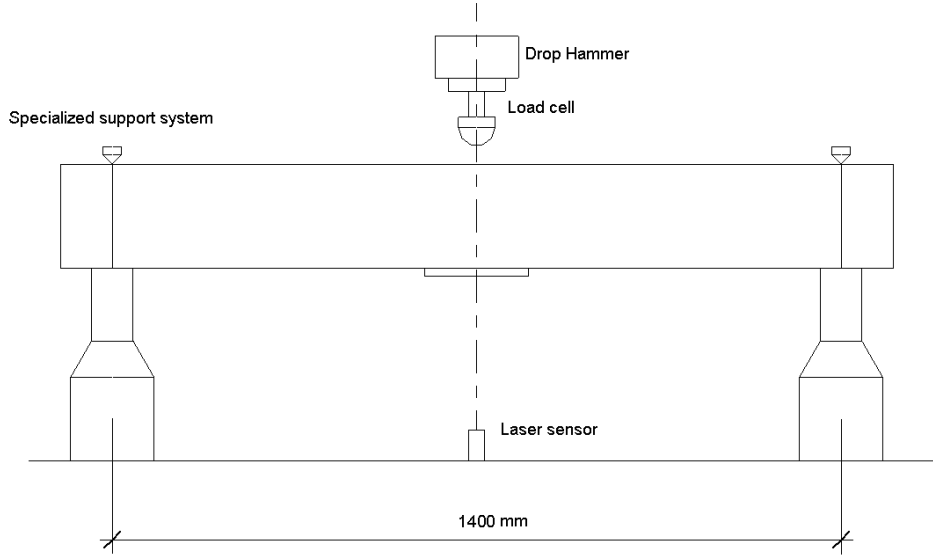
Drop hammer test setup (Fujikake et al. 2009)
